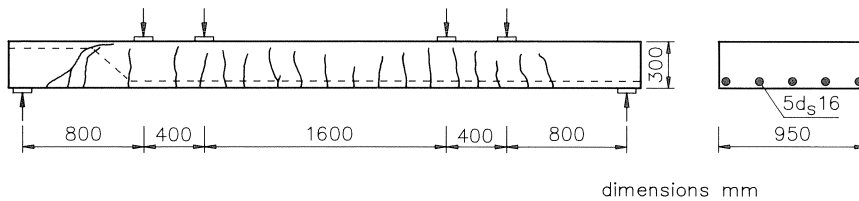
Crack pattern of a reinforced concrete plate [Rehm and Rüschi, 1964].
